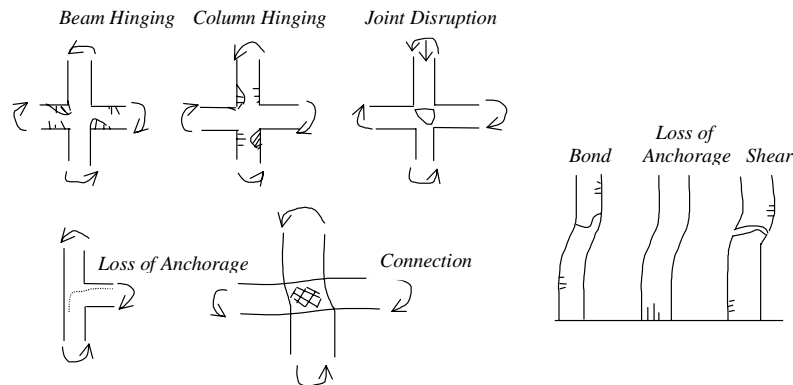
Ductility-Related Failure Modes (Folic, R. J.; 1991)
